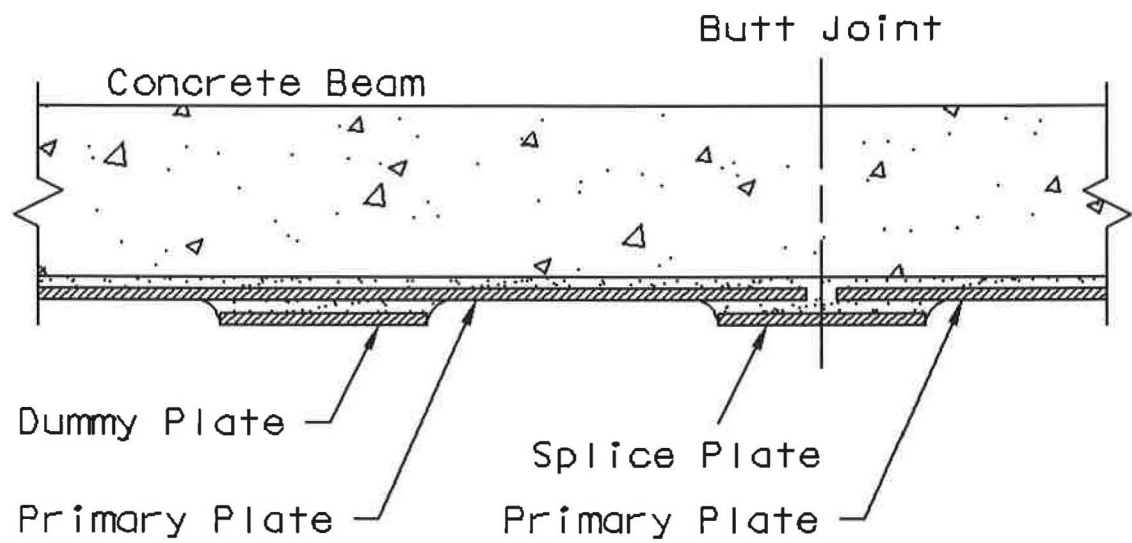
Plates Used During Flexural Strengthening Tests of Concrete Beams
